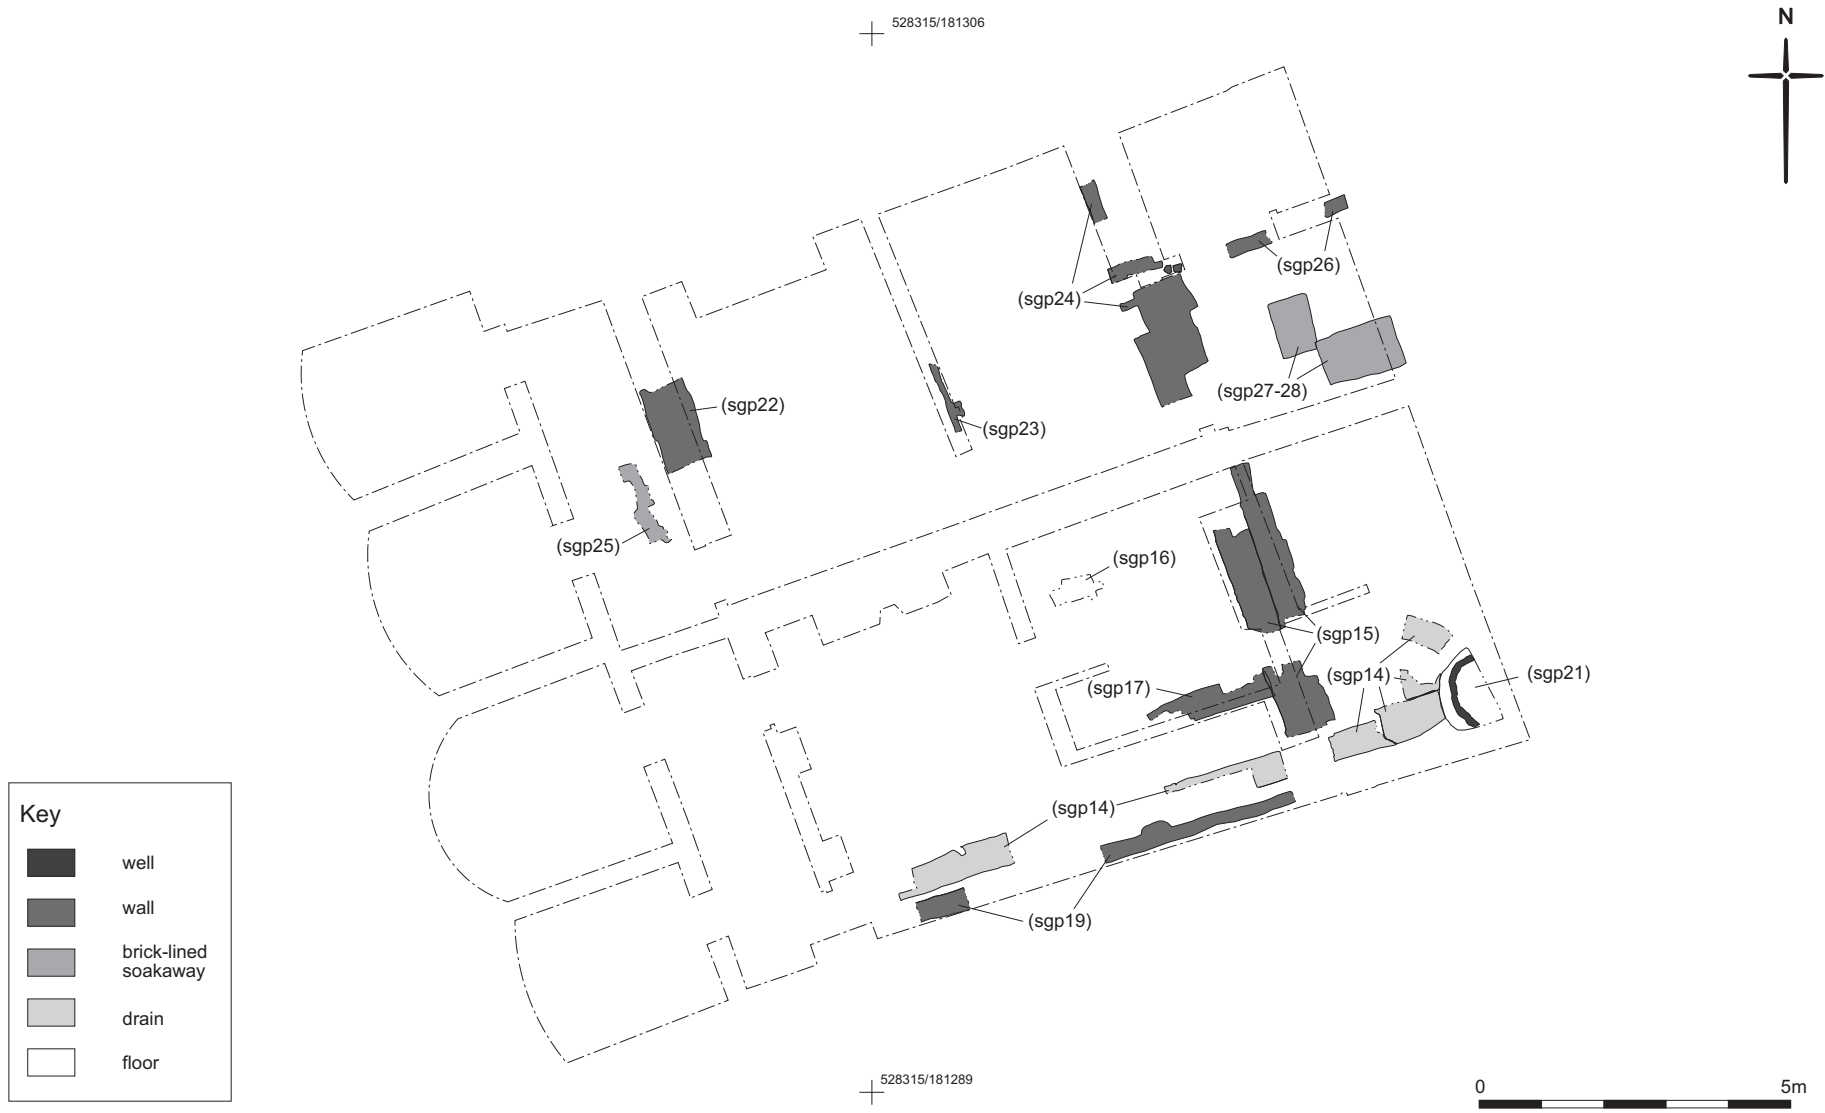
Structural remains recorded at the site, overlain by the basement plan of 9 and 11 Duke Street prior to demolition works (after Paul Davis & Partners, 2008)
